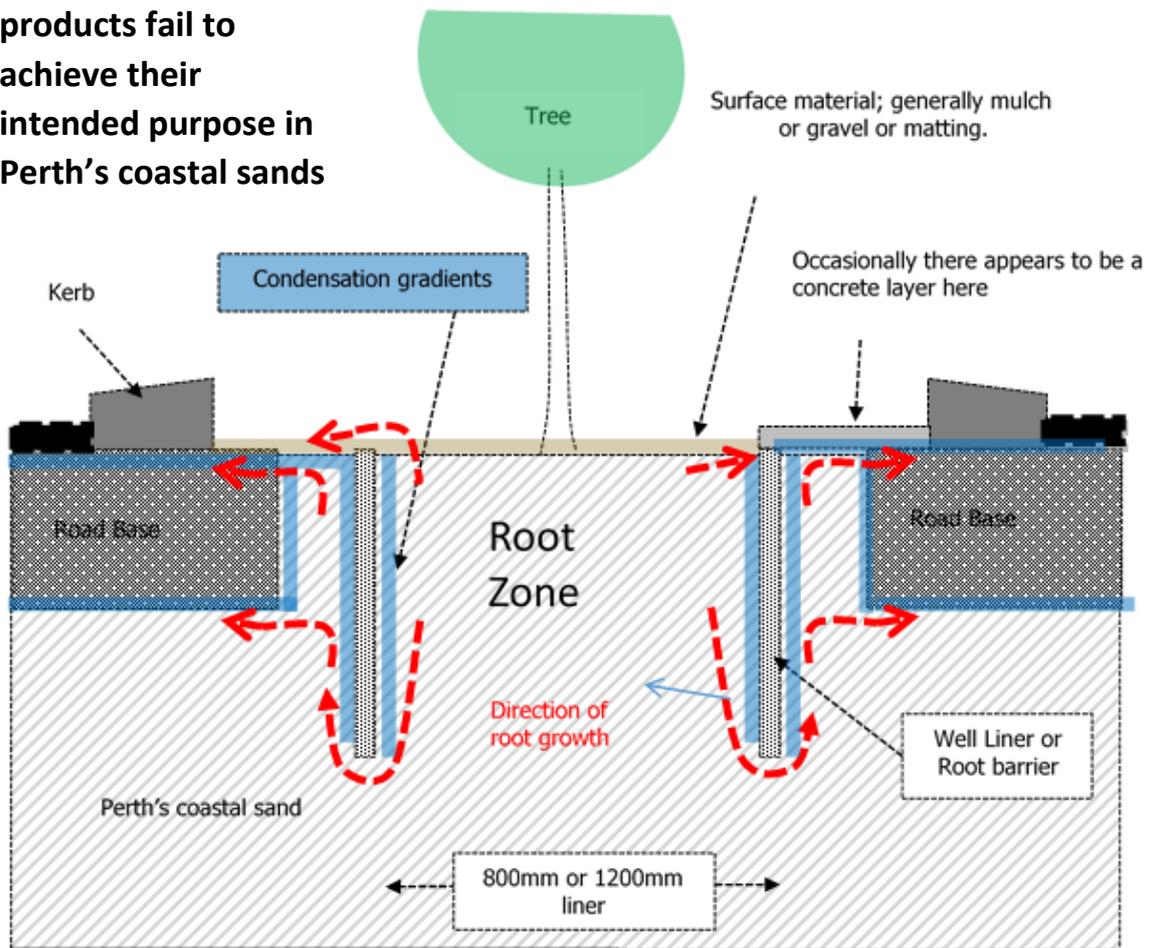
Typical root barrier installation showing where roots are drawn to and then escape from the barrier... Property of Arbor Centre
